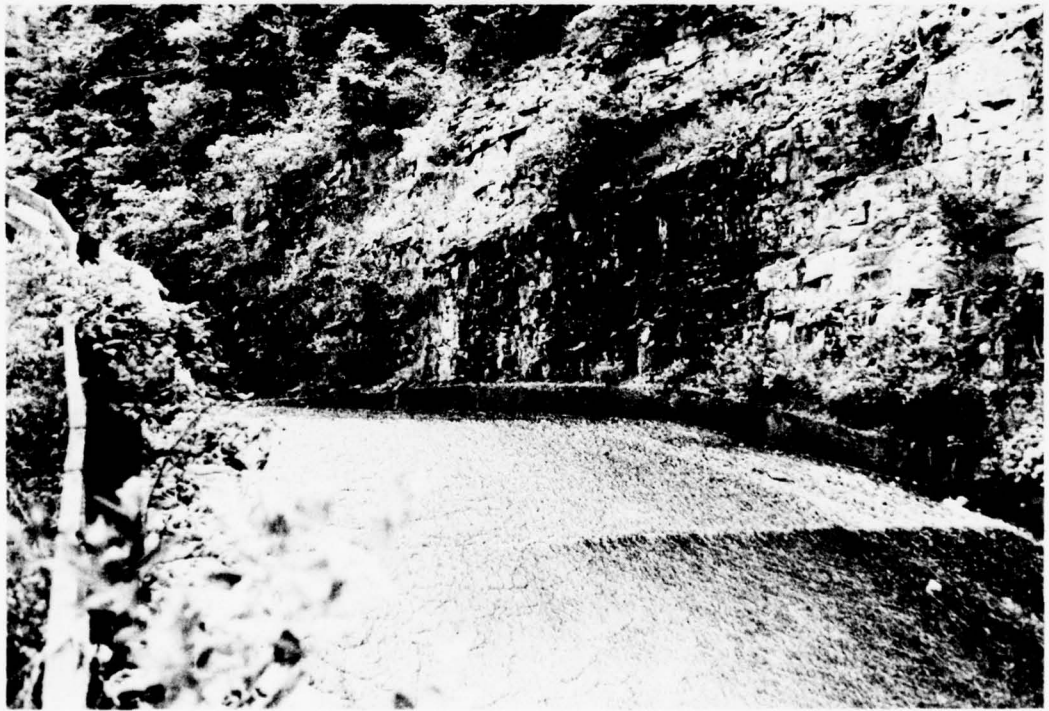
Downstream Drain Outlet Into Masonry Channel
